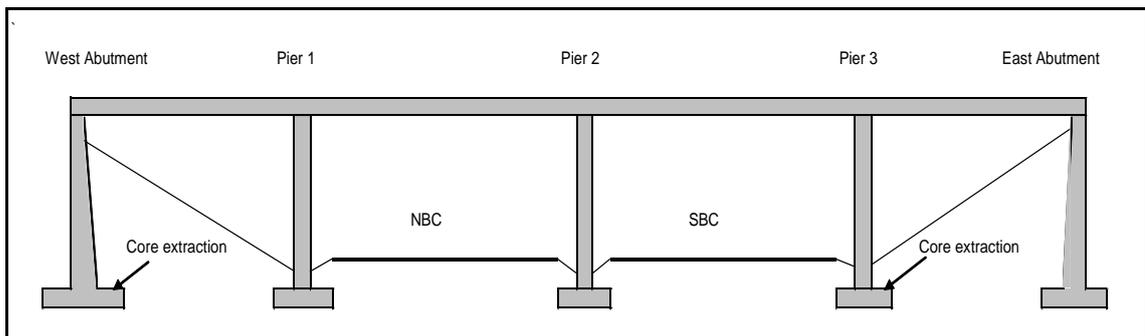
Positions of limited coring undertaken on the N2 Overpass Bridge
